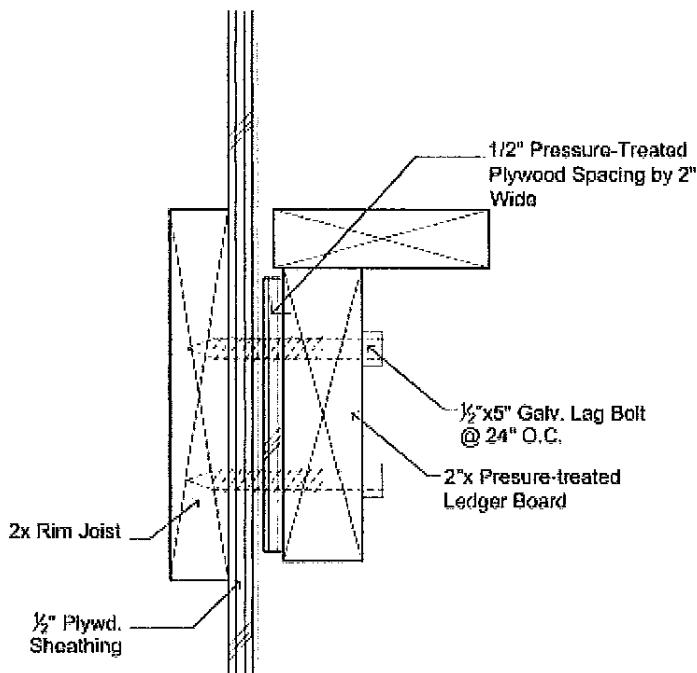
Alternate Connection Detail: 1/2" PT Plywood and 1/2" Drainage Spacers
